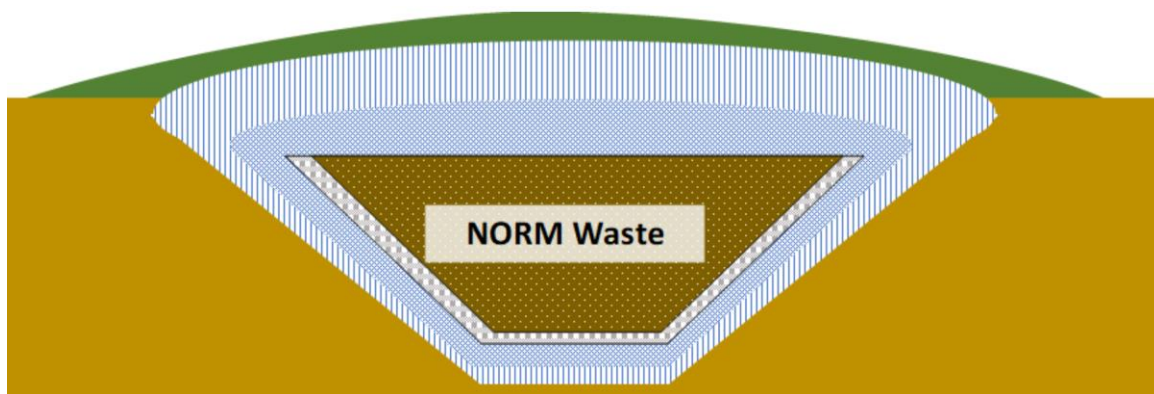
Example illustration of a landfill disposal facility with engineered surface features (AELB, 2020)
